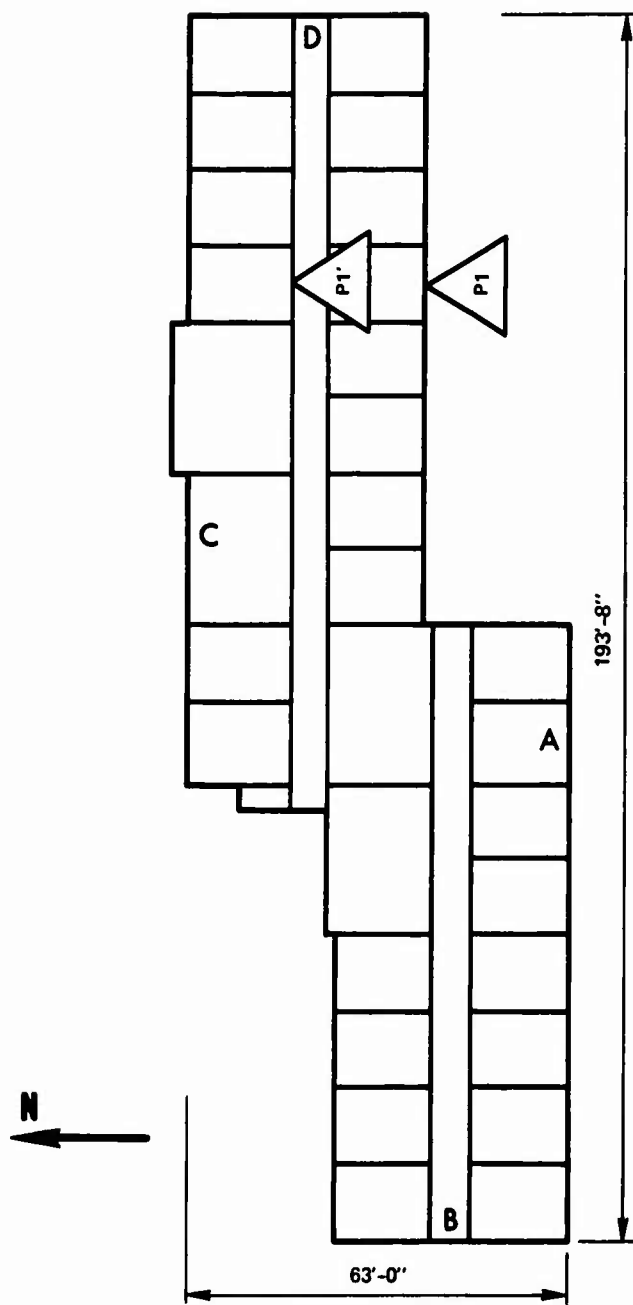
PLAN VIEW OF INTERIOR WALLS ON UPPER STORIES
